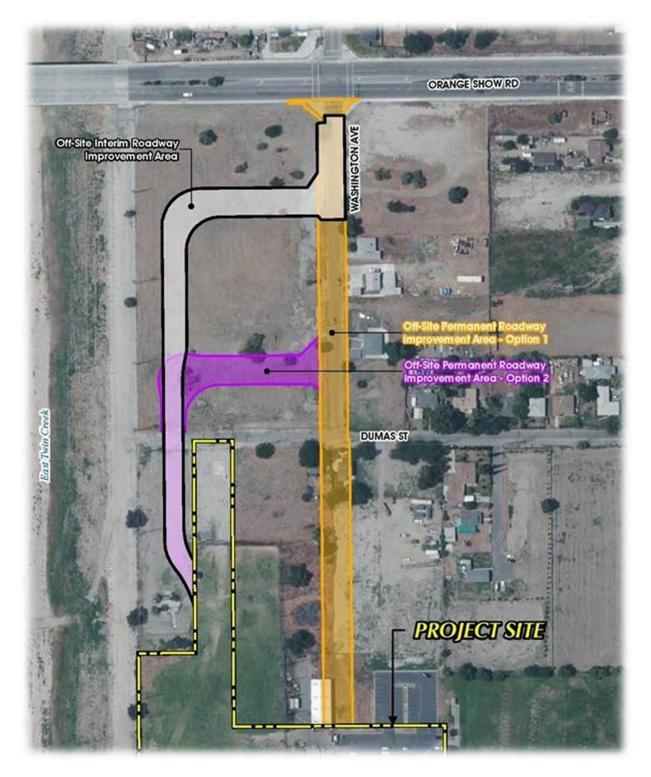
C: SITE ACCESS ALTERNATIVES
